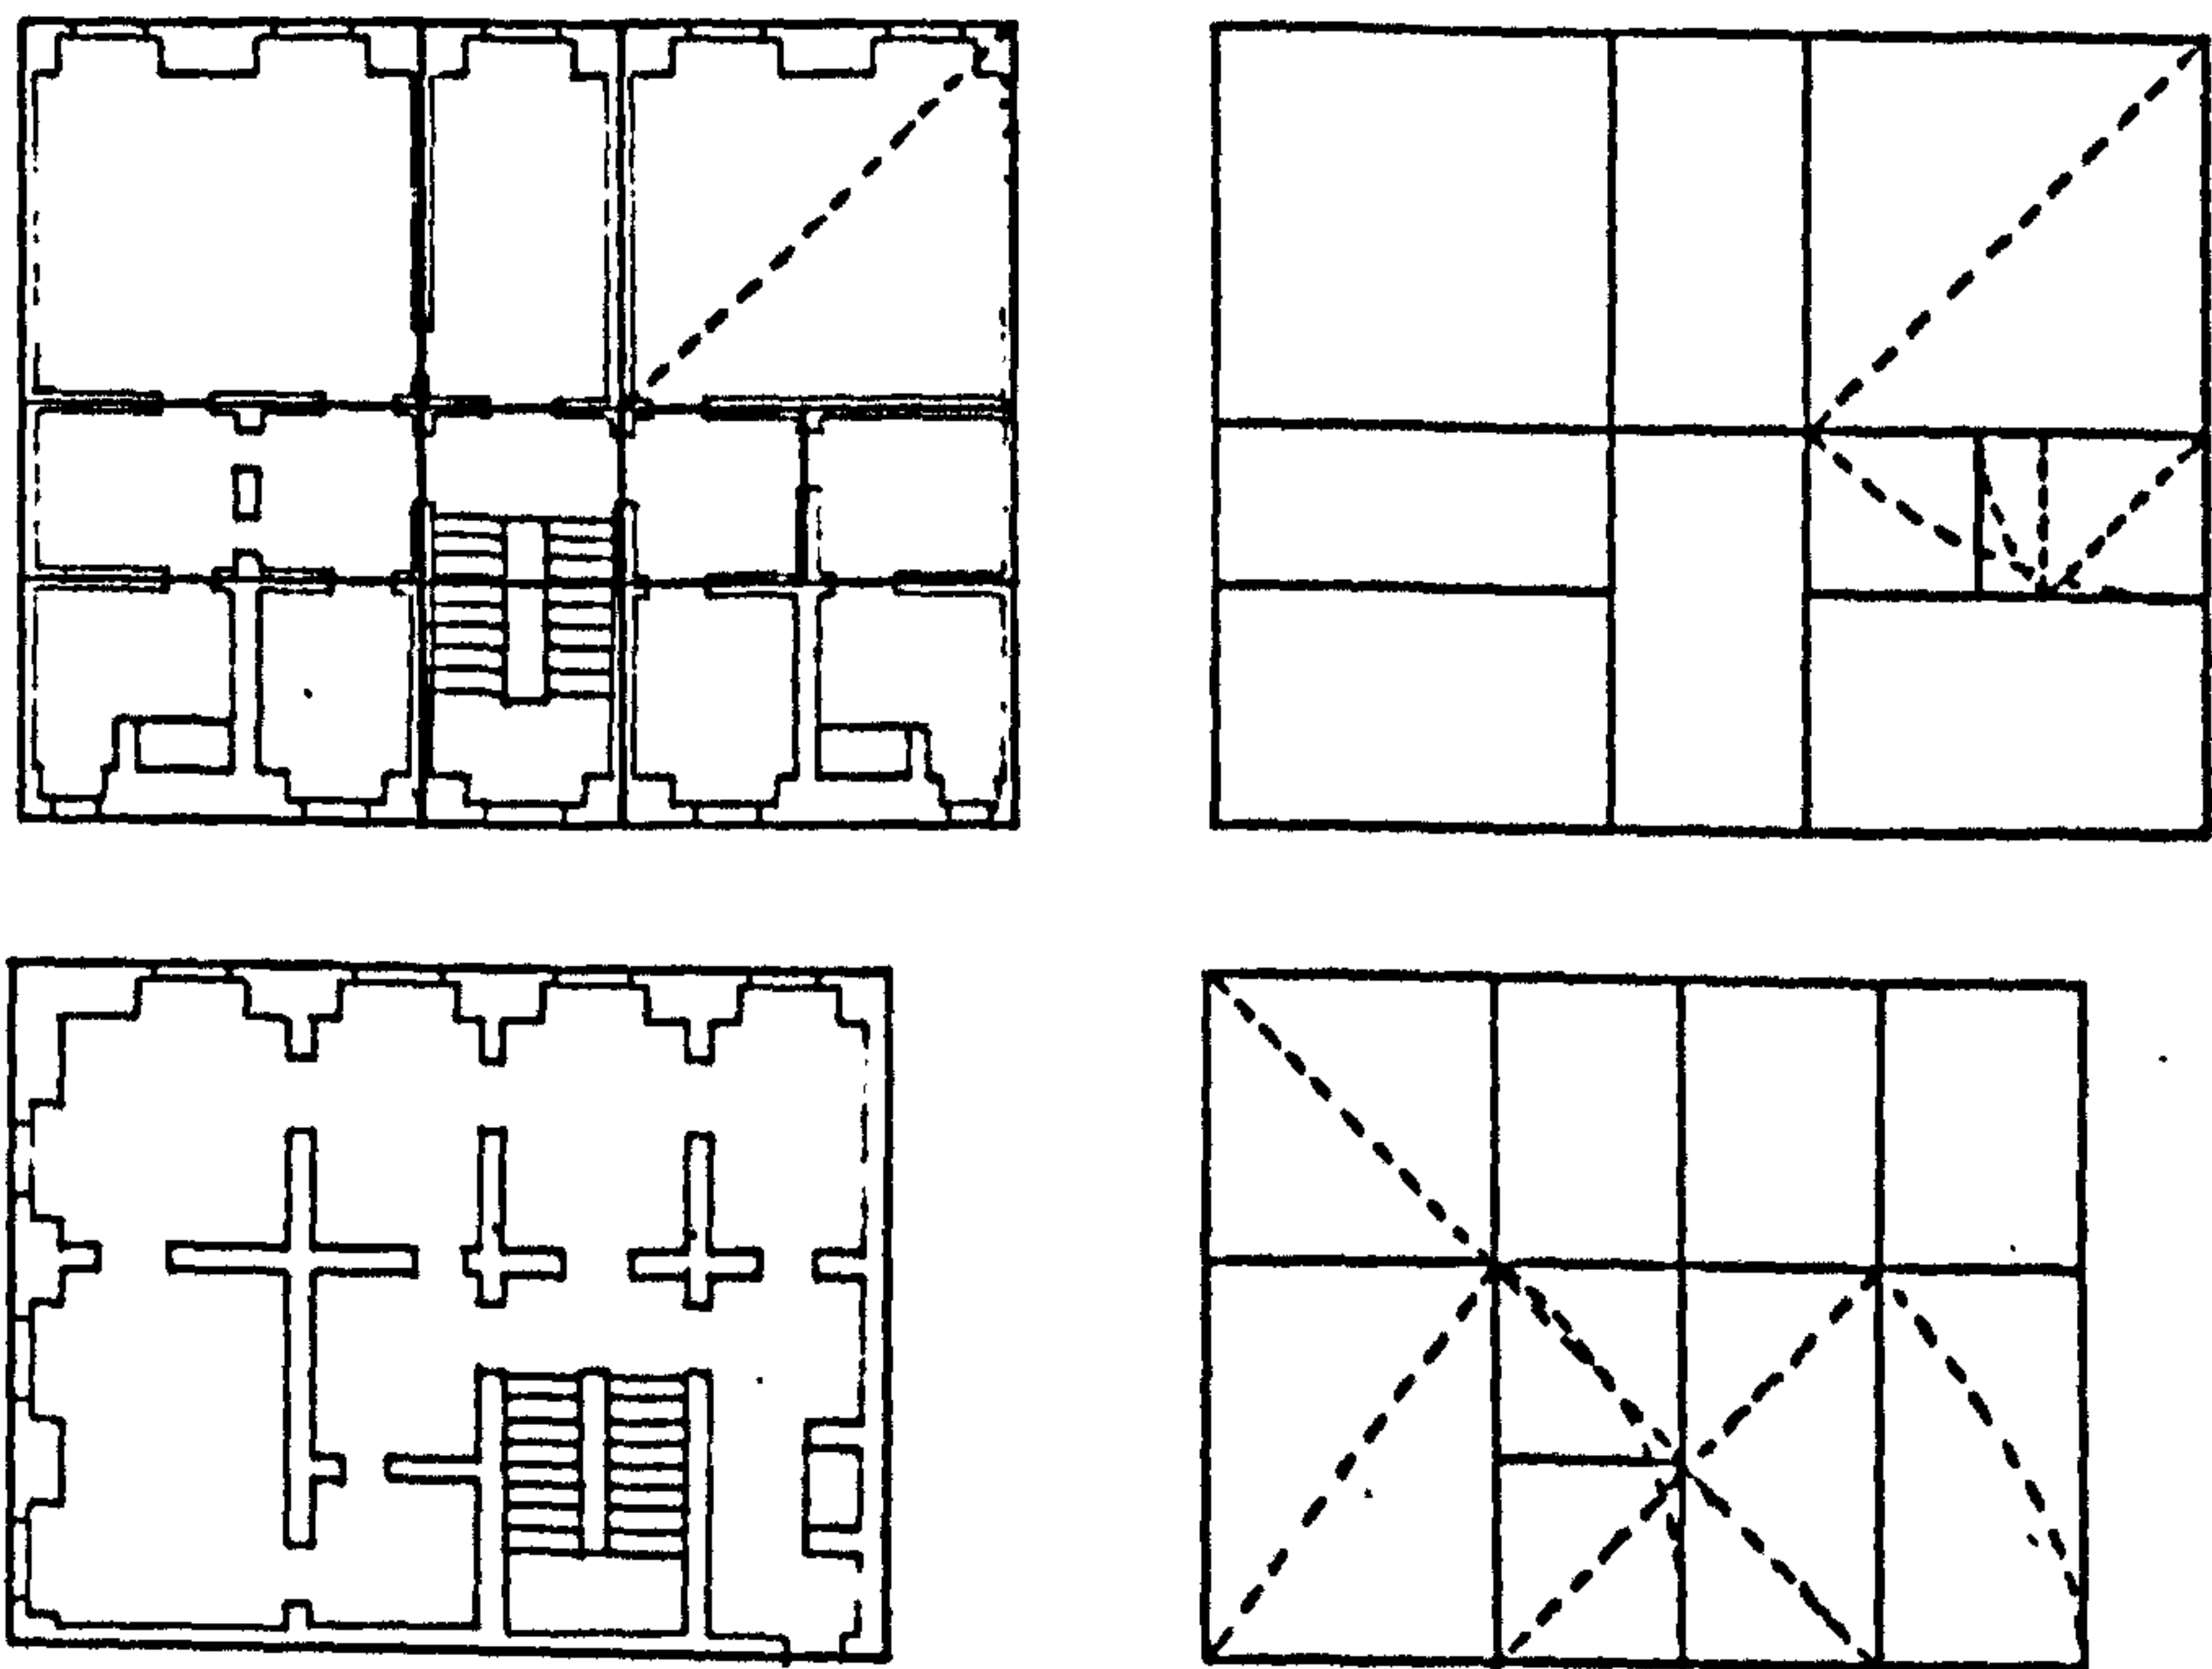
The square rooms behind the street façade define the depth of the second row of rooms: example 1
